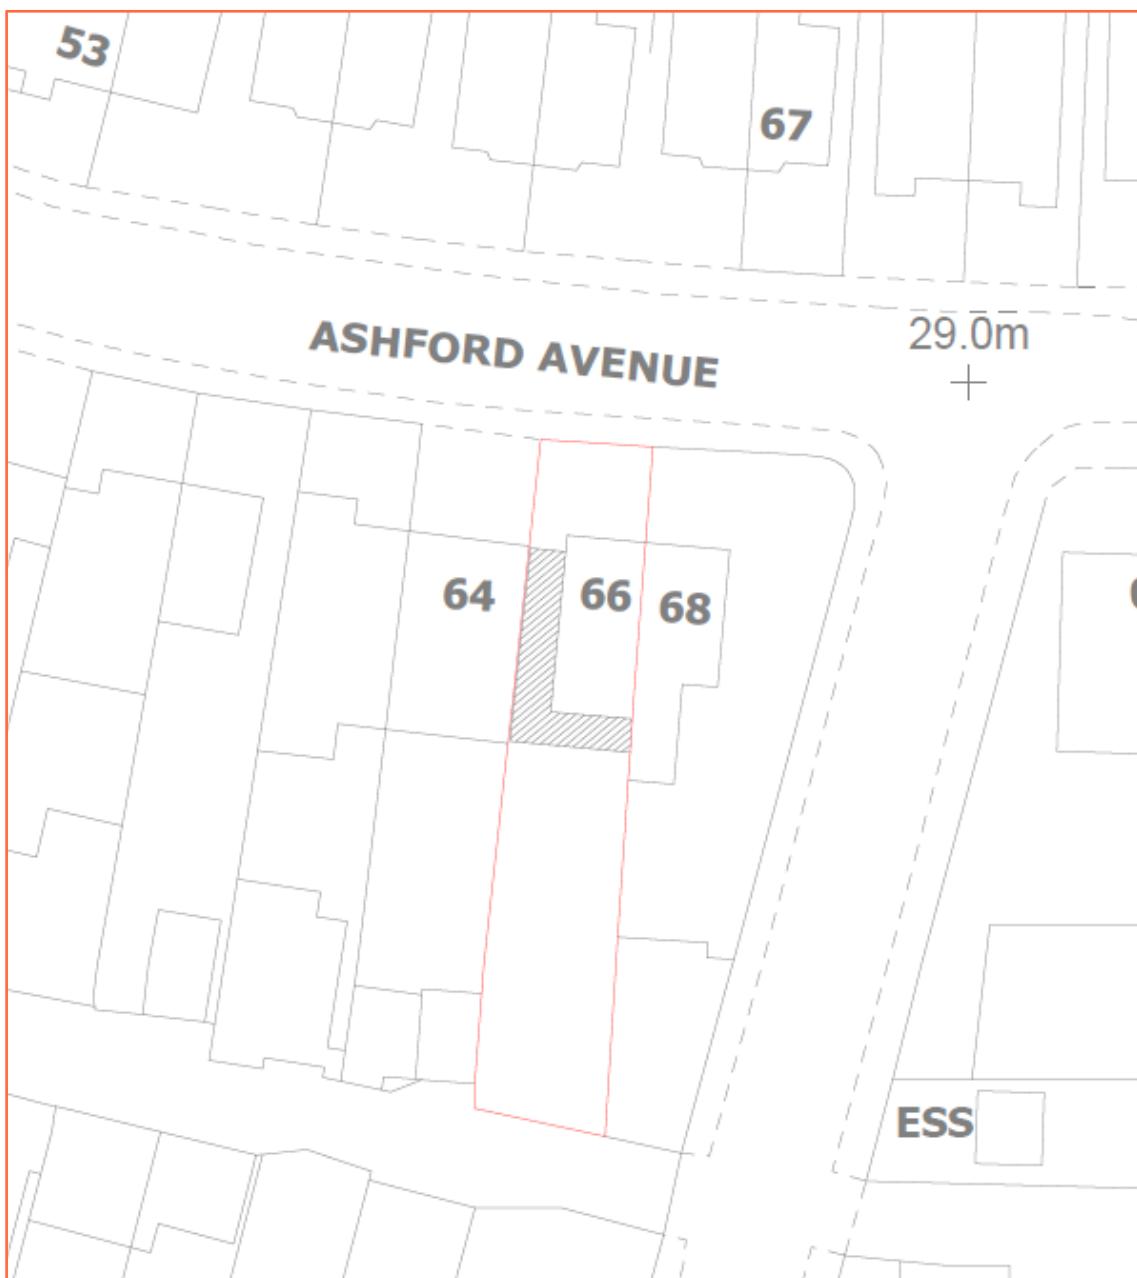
Proposed site plan for wrap around extension (Source: AMBA Architecture)
